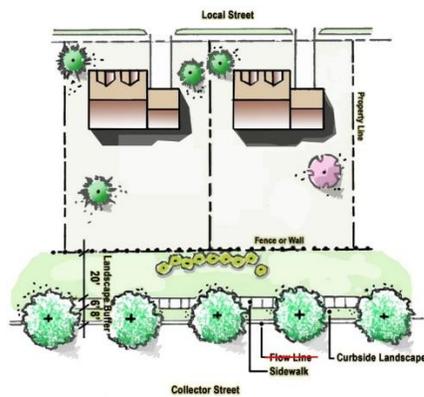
Collector Street Frontage Buffer Measurement Detached Straight Walk
